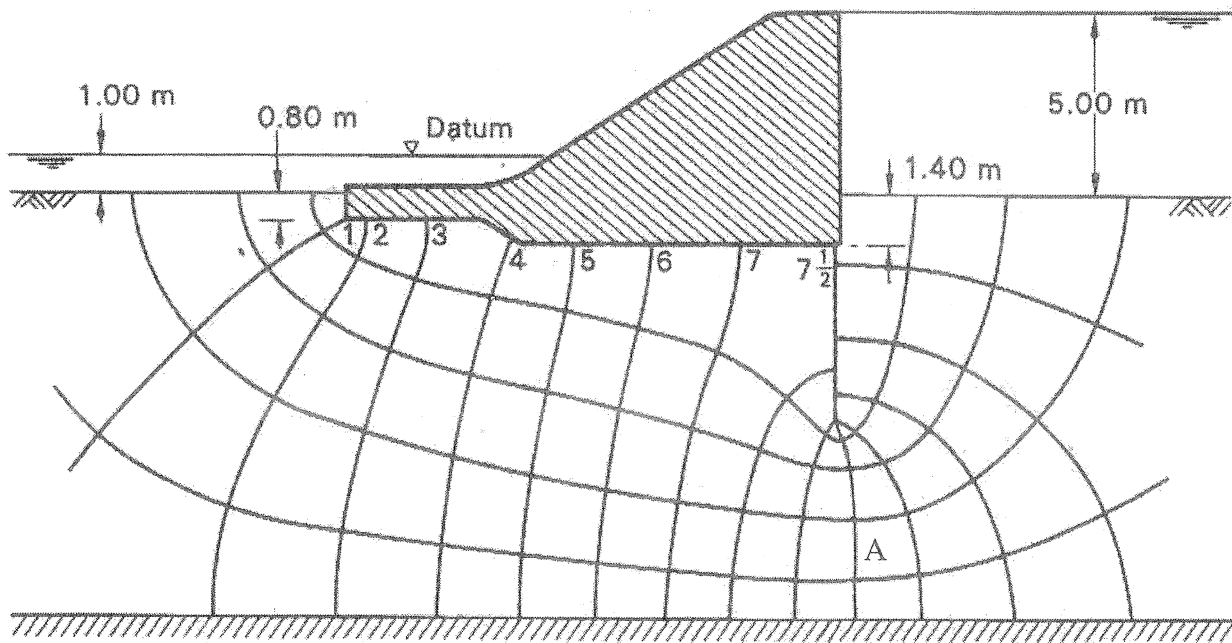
Flow net for the concrete dam with a cutoff wall
